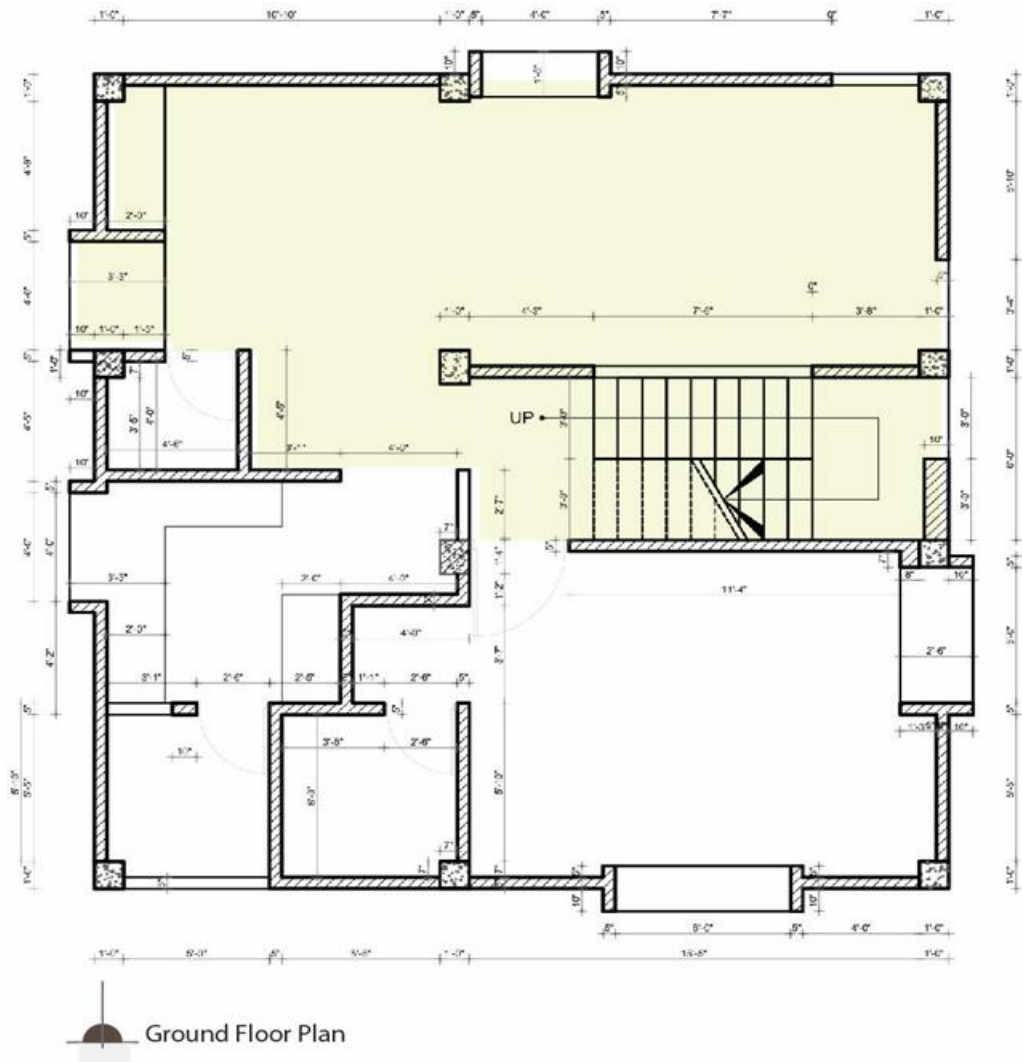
Ground floor plan showing dining cum living room (highlighted)
